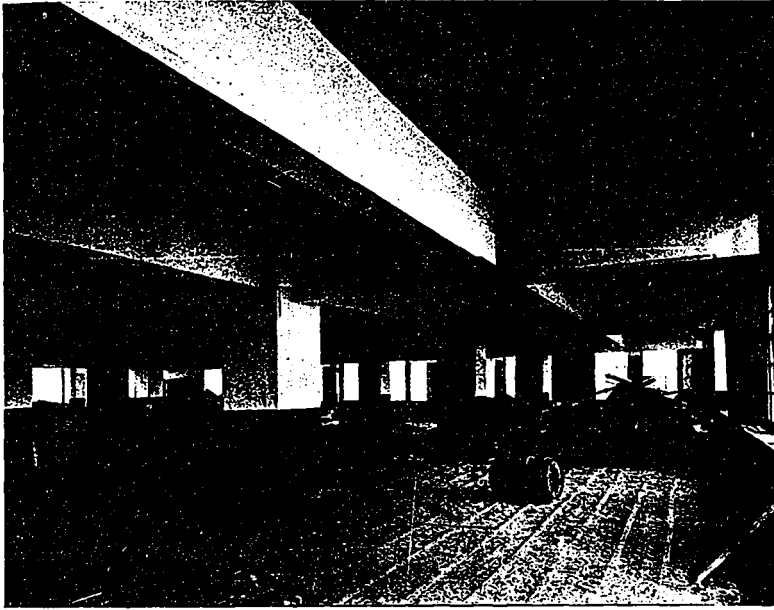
INTERIOR VIEW OF GROUND FLOOR OF ANDREW DARLING BUILDING, SHOWING THE MASSIVE REINFORCED CONCRETE BEAMS, GIRDERS AND COLUMNS, THAT SUPPORT THE FLOORS. THE SPRINKLER PIPES RUNNING THROUGH THIMBLES IN THE BEAMS AND GIRDERS MAY BE SEEN. NOTE THE LARGE AMOUNT OF LIGHT THROWN TO THE CENTRE OF THE BUILDING.
